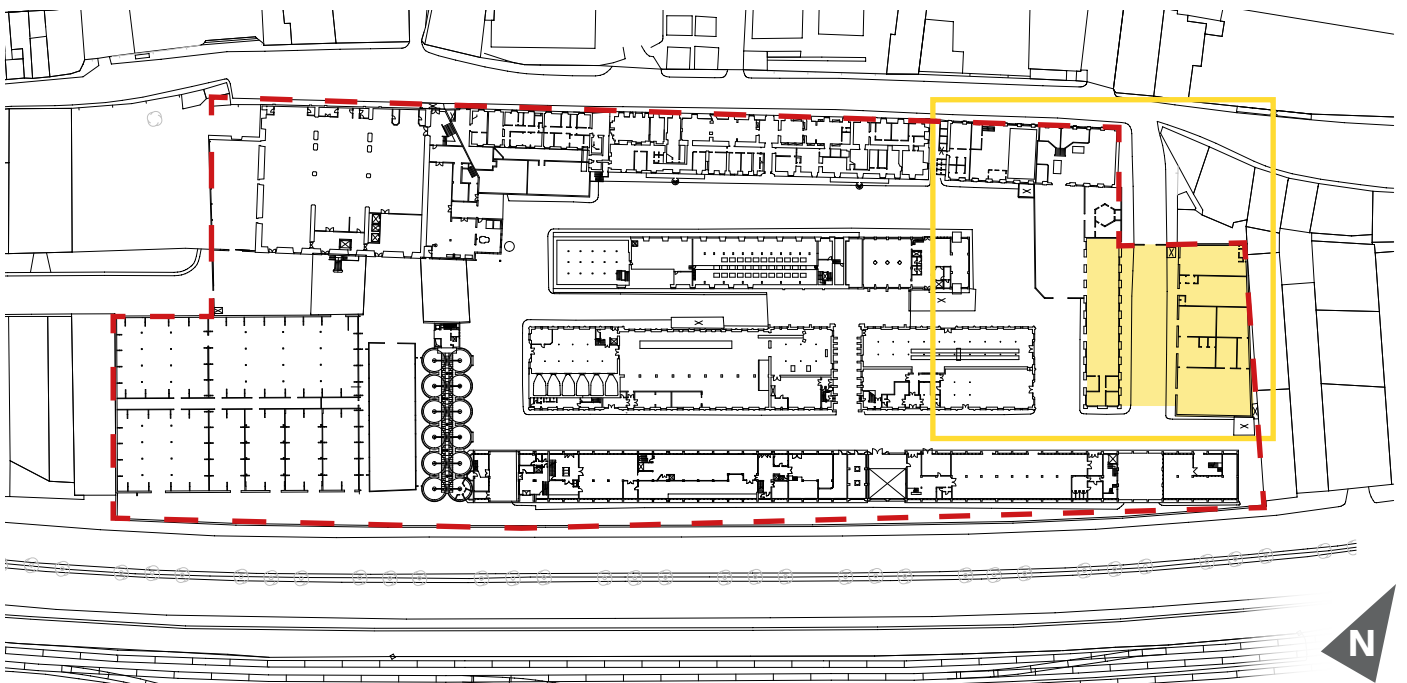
mmc site plan (docomomo int., 2016) — site border — ensemble — buildings
